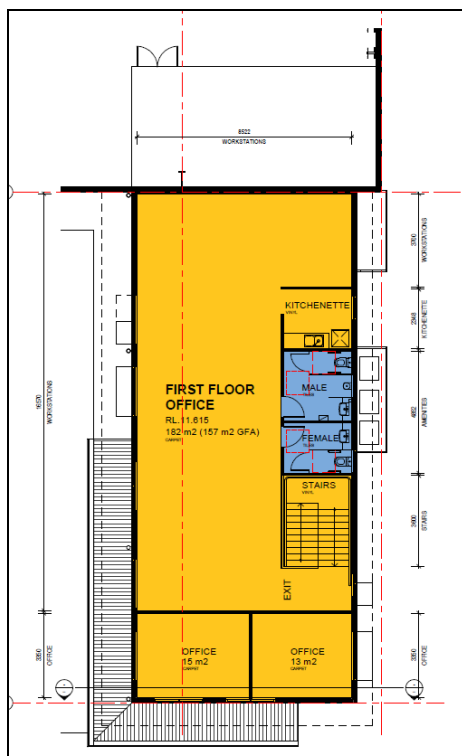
First Floor Office Plan (Source: Multi Span Australia Design Construct)
